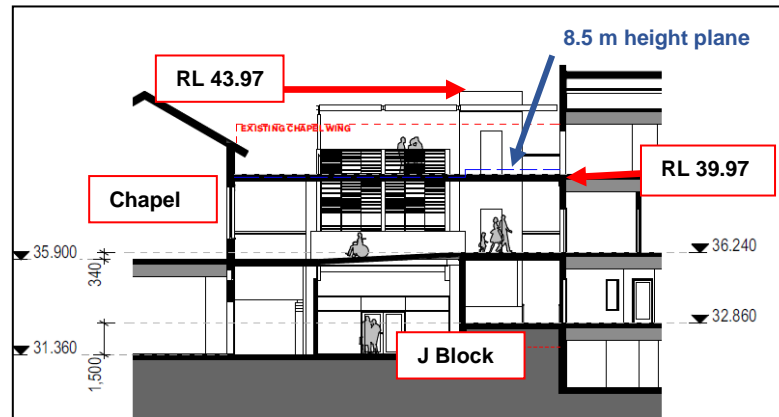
Section through southern precinct connector pod (Stage 1) (Source: Applicant's EIS)
